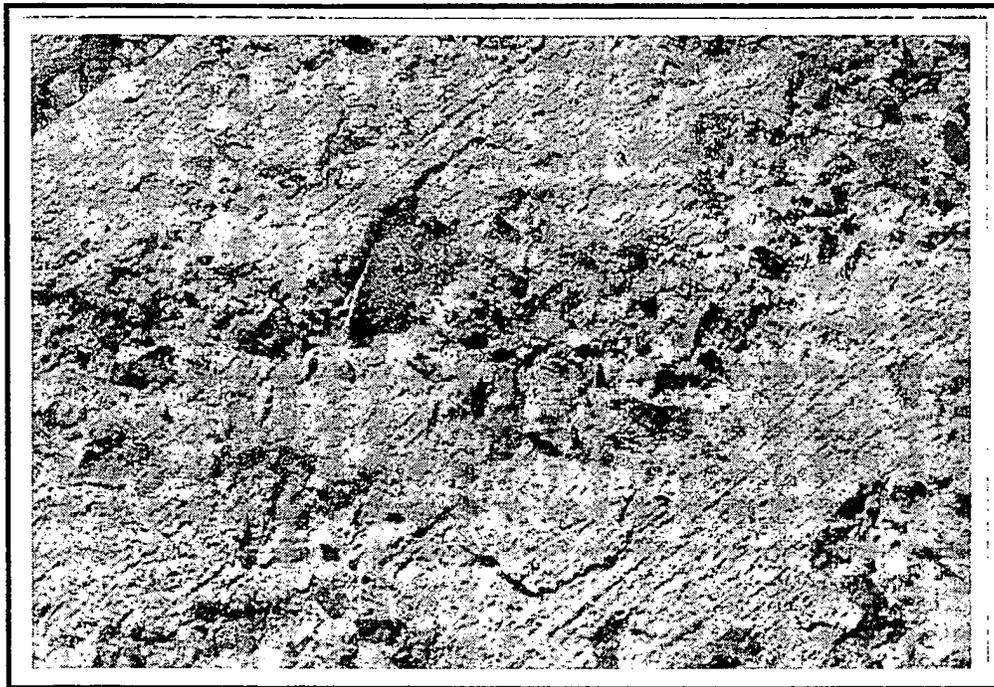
Surface Deterioration in CRC Pavement, High Severity
